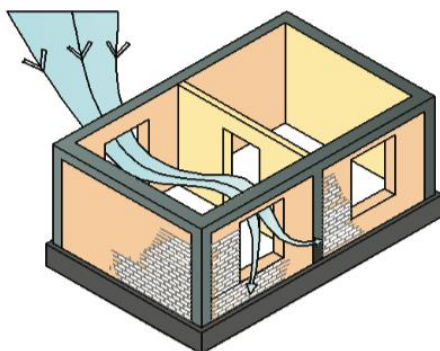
Openings on Opposite Walls Creating Flow Path [61]
